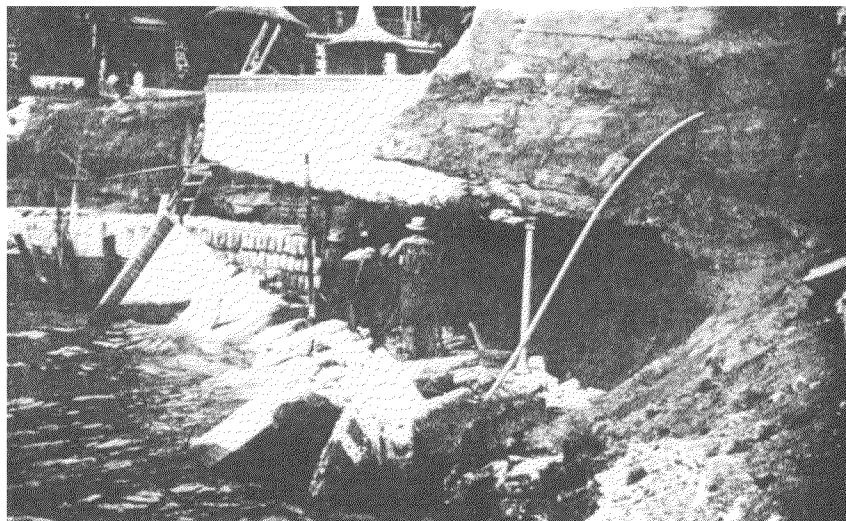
Hotel Tzanjuyu (Lake Atitlan) swimming pool damaged by a subaqueous landslide. A retaining wall is under construction to protect the area from erosion by lake waves.
